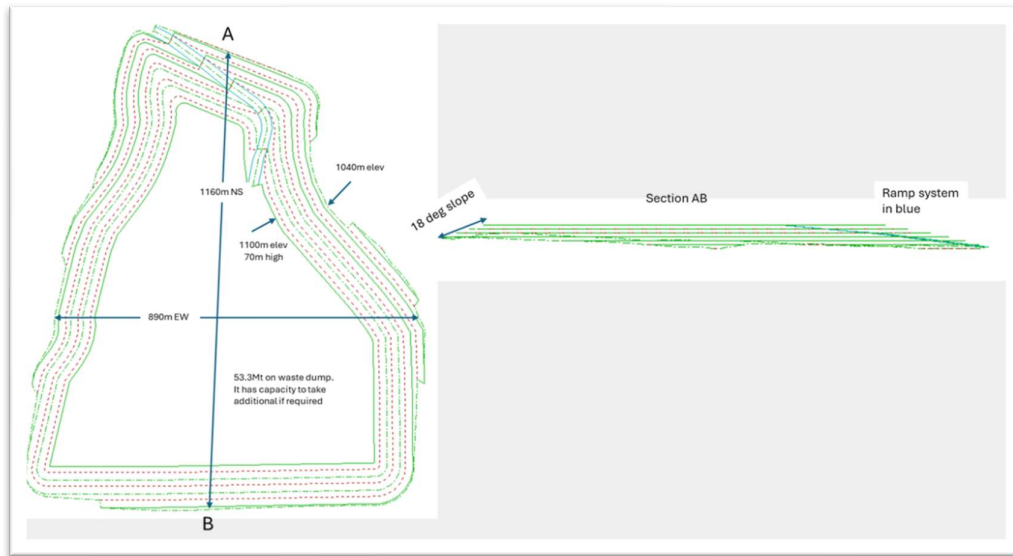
Plan And NS Section Of The Waste Rock Dump
